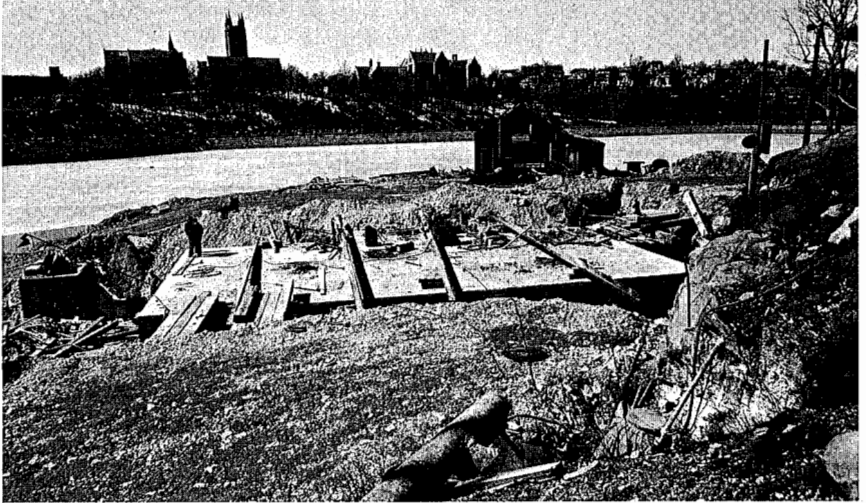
Concrete roof slab over Shaft 7, looking westerly toward Boston College across Lawrence Basin of Chestnut Hill Reservoir. This portion of the reservoir has now been filled in and converted to an athletic field and parking lot. The slope, 70 feet high and composed of conglomerate, is a fault-line scarp that was exposed in the tunnel at station 245 + 00. 3/20/50.
